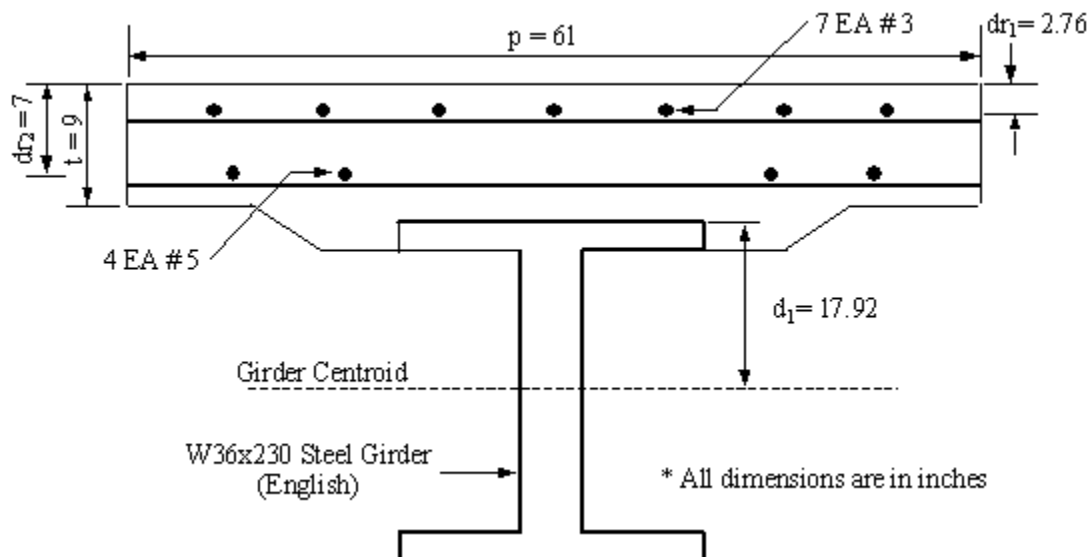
Geometry and reinforcement arrangement of the deck section supported on steel girders
